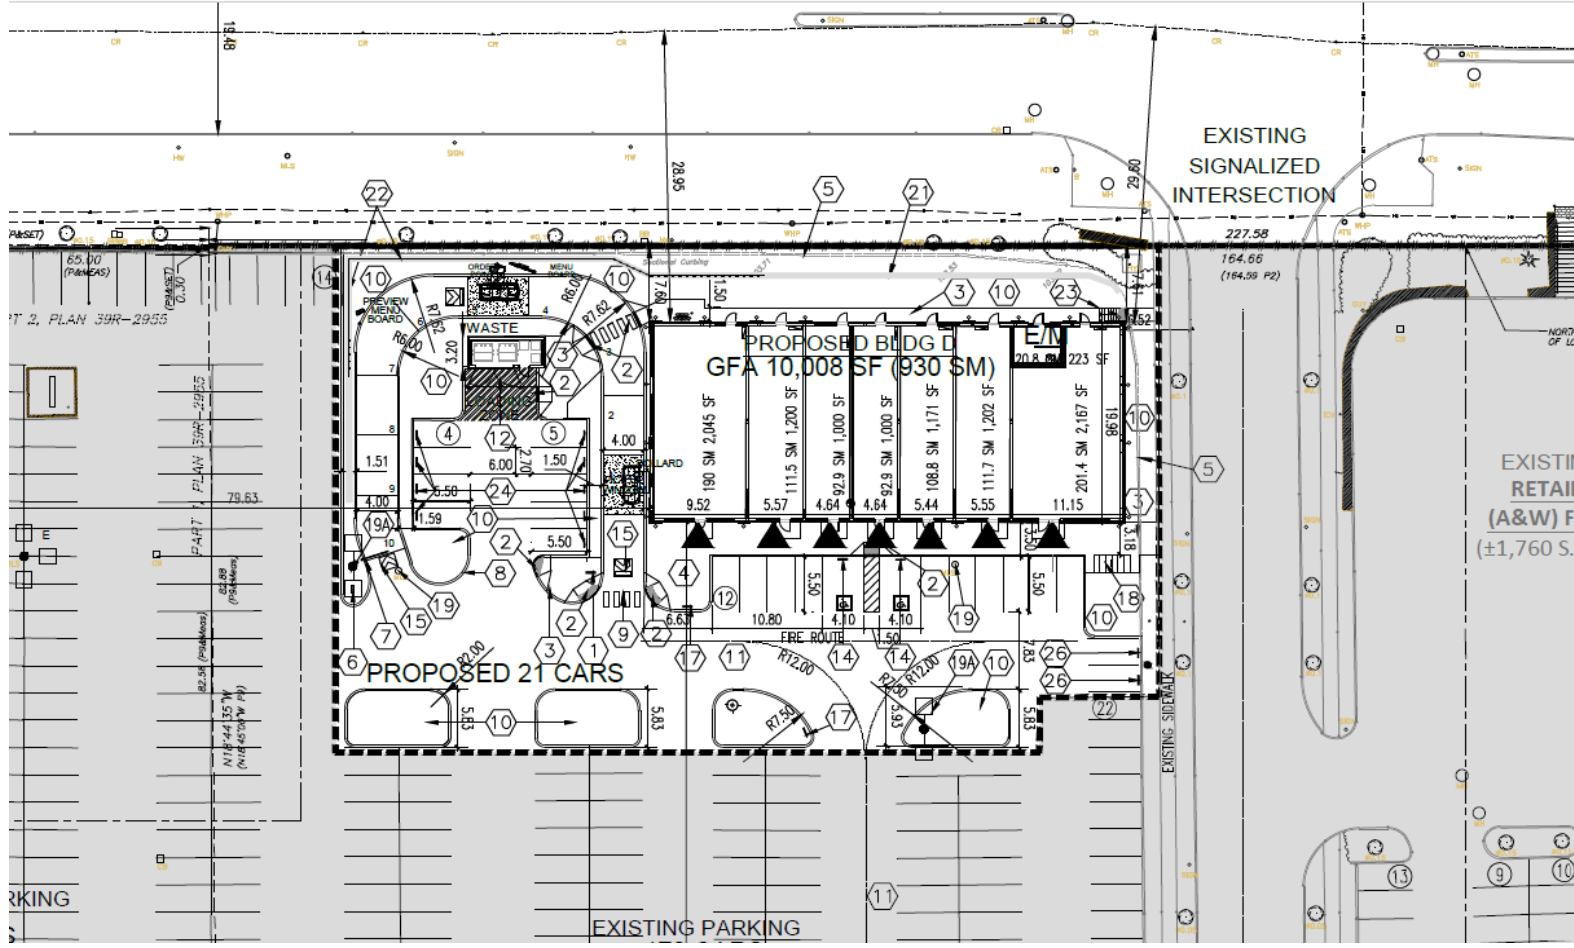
LANDSCAPE PLAN, BUILDING AREA
